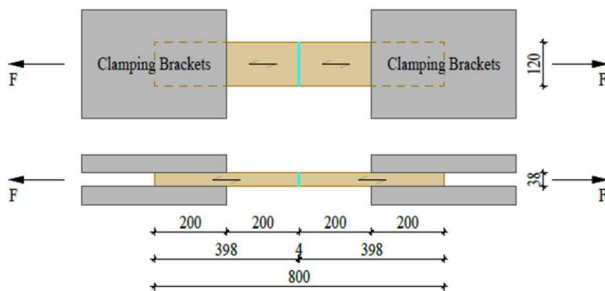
Schematic structure tensile test; all dimensions in (mm).
